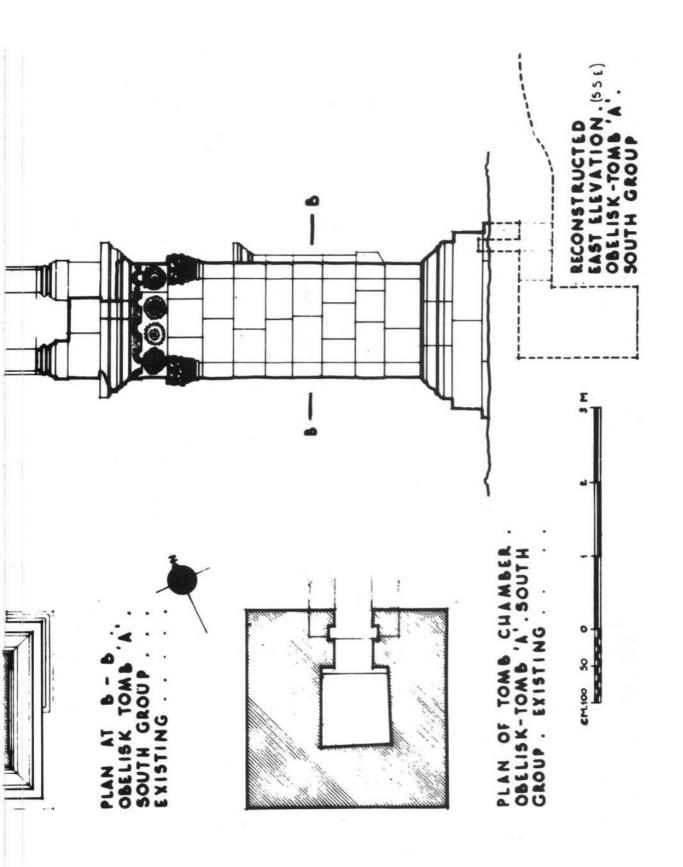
Tomb South A: east elevation and plans. Drawn by J. Keelan.
